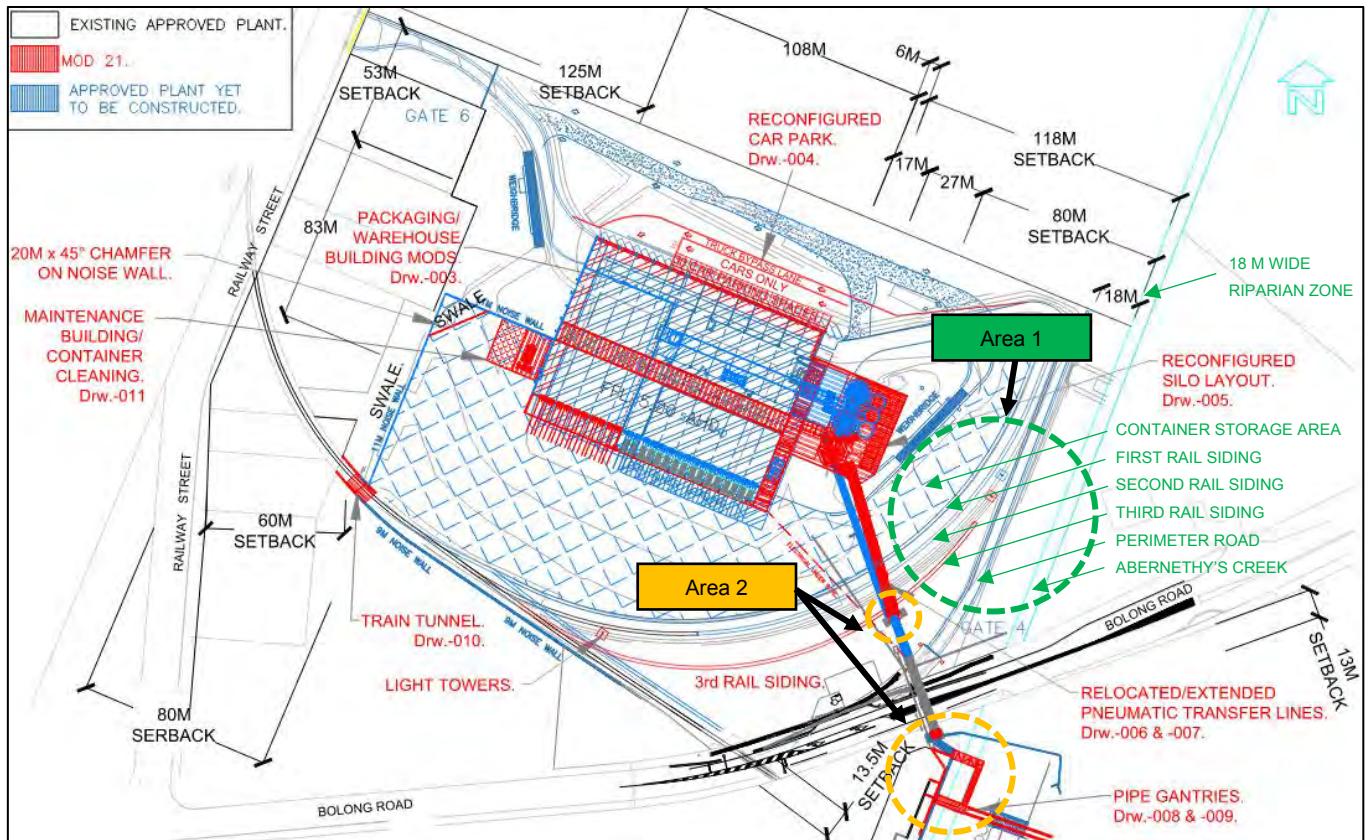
Shoalhaven Starches Overall Site Plan, Packing Plant Mod 21 Proposal (Manildra Group Ref: Project 7117WAE, DWG No. MN7323-002)
